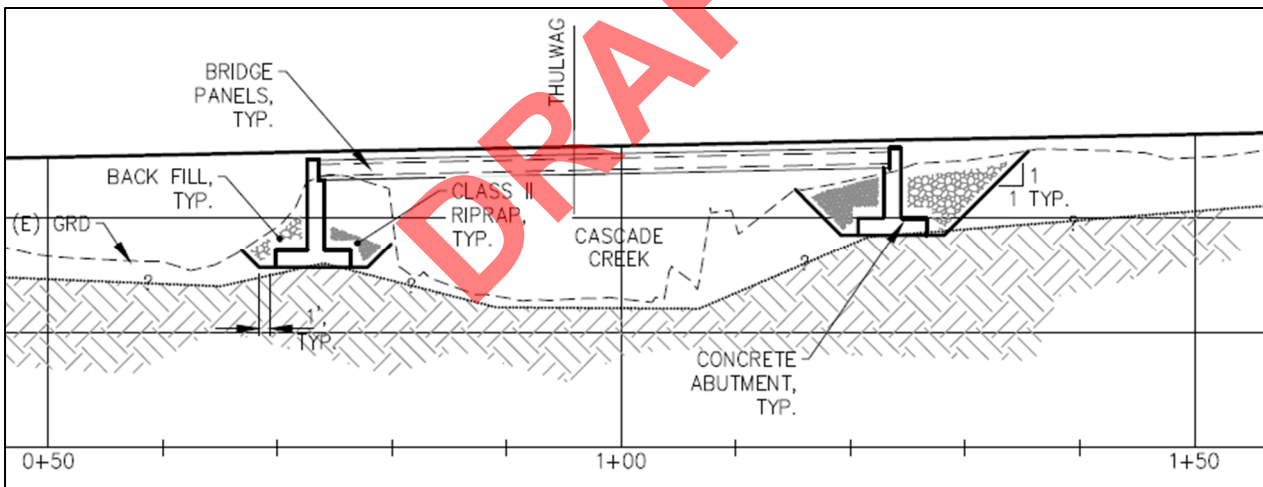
Proposed bridge elevations at centerline of bridge (PND, 2025).
